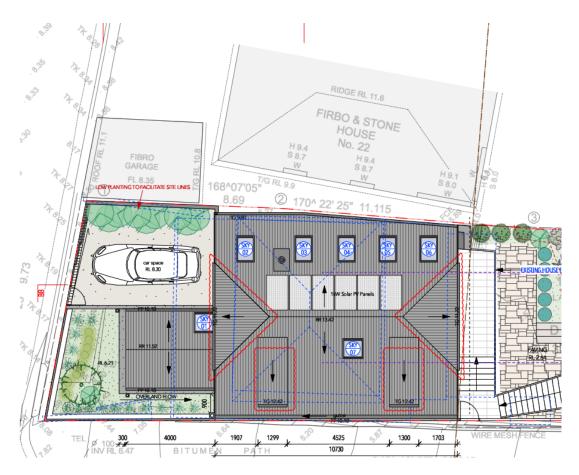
Site Plan illustrating proposed BLZ in context of neighbouring dwelling (COSO Architecture, March 2023)
